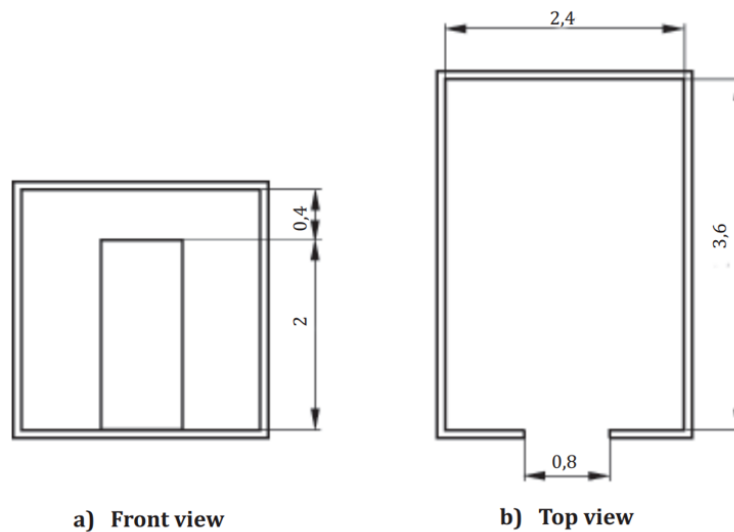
The dimensions, in metres, of the ISO 9705 room for fire testing. Reproduced from ISO 9705-1 Reaction to fire tests - Room corner test for wall and ceiling lining products [62].
